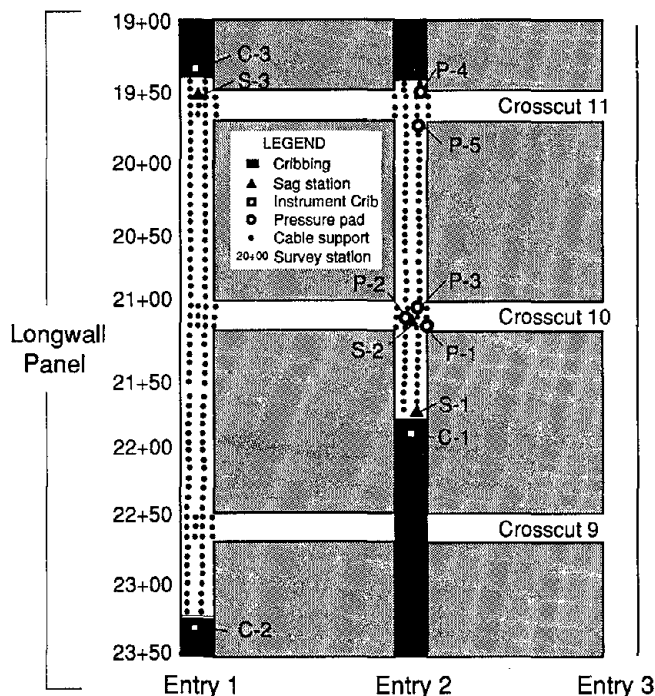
Gate roads showing the cement-grouted cable test area and instrumentation layout at a western U.S. underground longwall mine.
